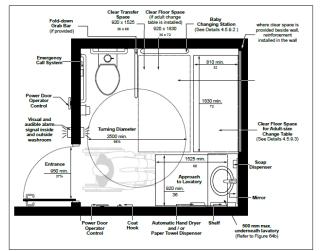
Example of Universal Washroom Layout and Typical Amenities (Conceptual - Layouts Can Vary)
